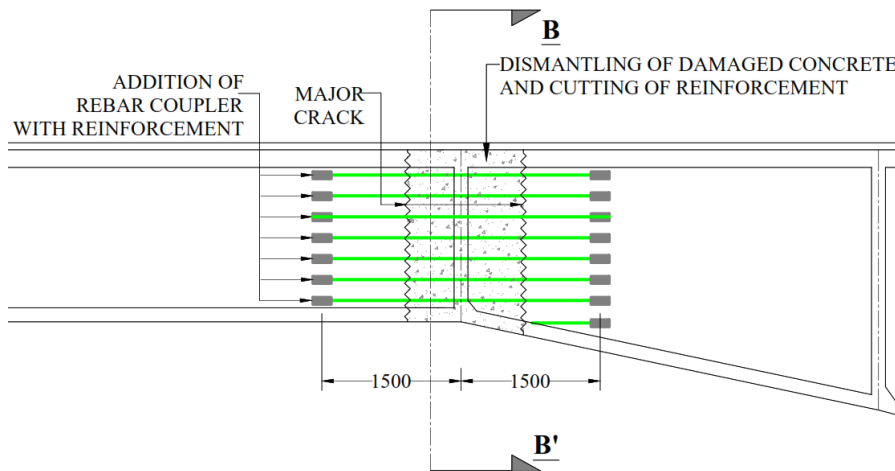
Details of repair methodology for major crack at highly distressed section between span P11-P12.
